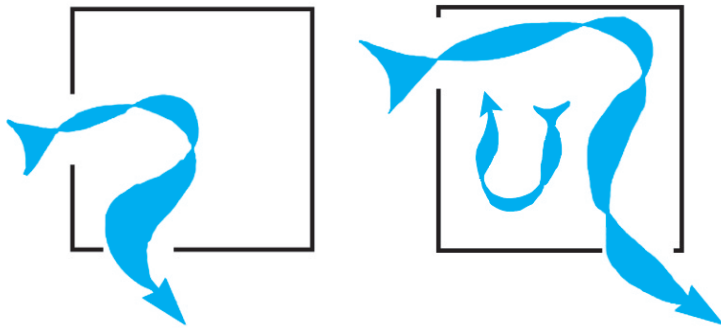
Window Arrangement for Cross Ventilation (Adjacent Walls).
